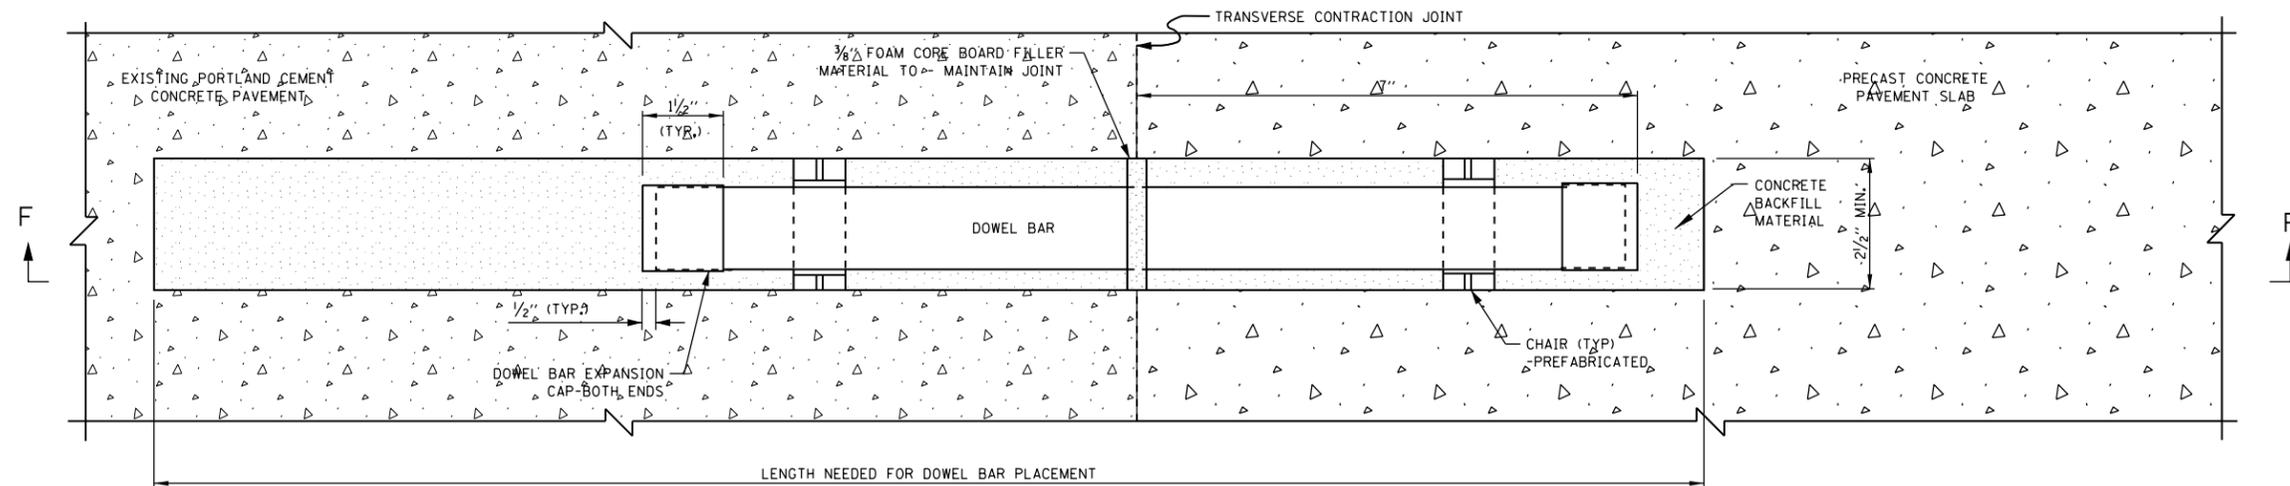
DETAIL E - WIDE MOUTH DOWEL BAR PLACEMENT DETAIL FOR CONSECUTIVE STANDARD PRECAST PANELS
